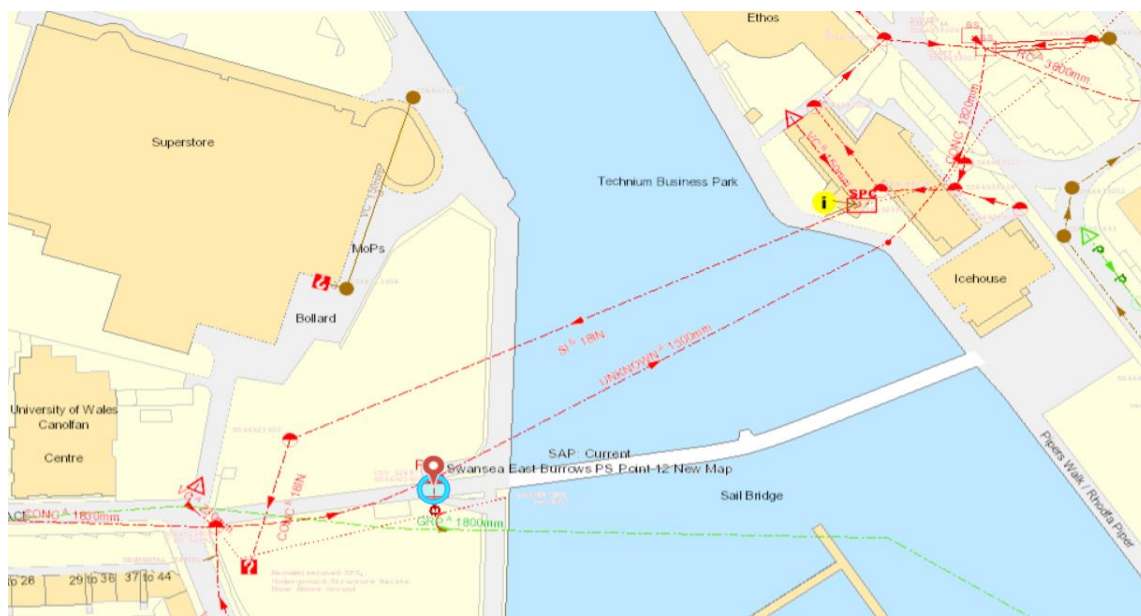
Plan of East Burrows Road CSO and surrounding Network
